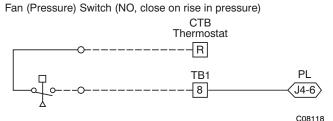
PremierLink Controller Wiring Fan Pressure Switch Connection
